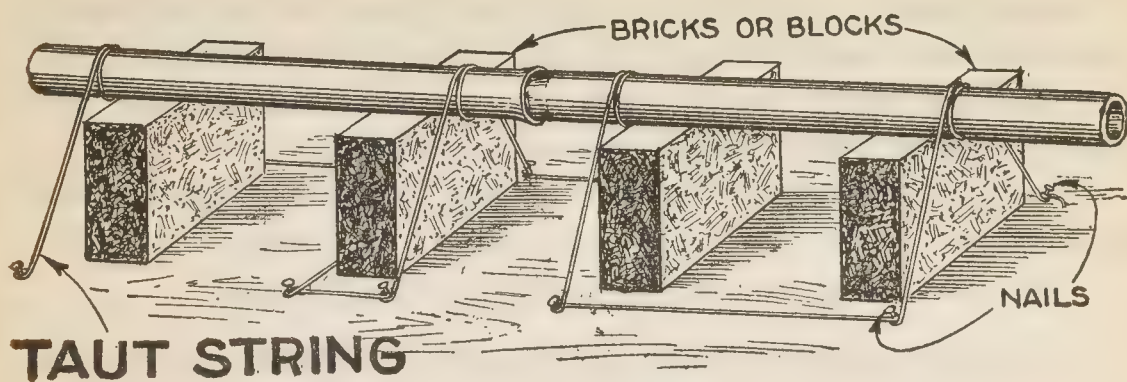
,444.—Preparing joint for wiping. 9. *Setting (old method)*, using blocks and nails.
